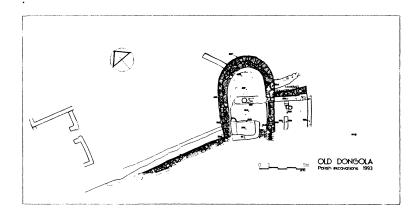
Plan of the northwestern tower. Drawing A. Gryglewska.
